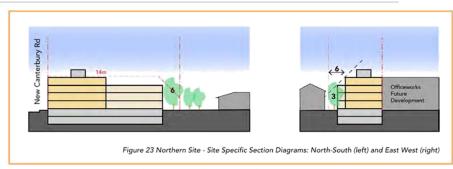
Fig B – Extract Urban Design Study – Urbanac - Sections for Site A
